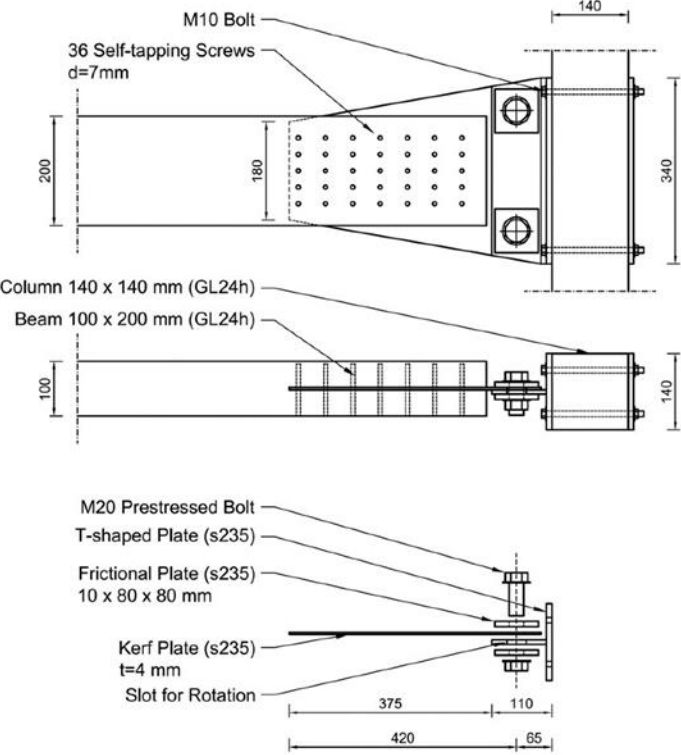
10 Design of the frictional damping device, the top and side view of the connection to a wooden beam and column (Polocoser, 2018).
